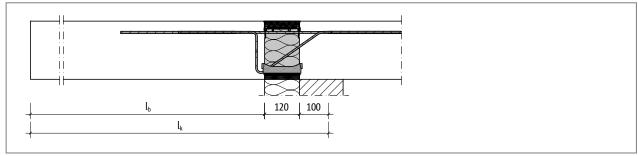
Schöck Isokorb[®] XT type K: System cantilever length (l_k) for design and geometric cantilever (l_b)
